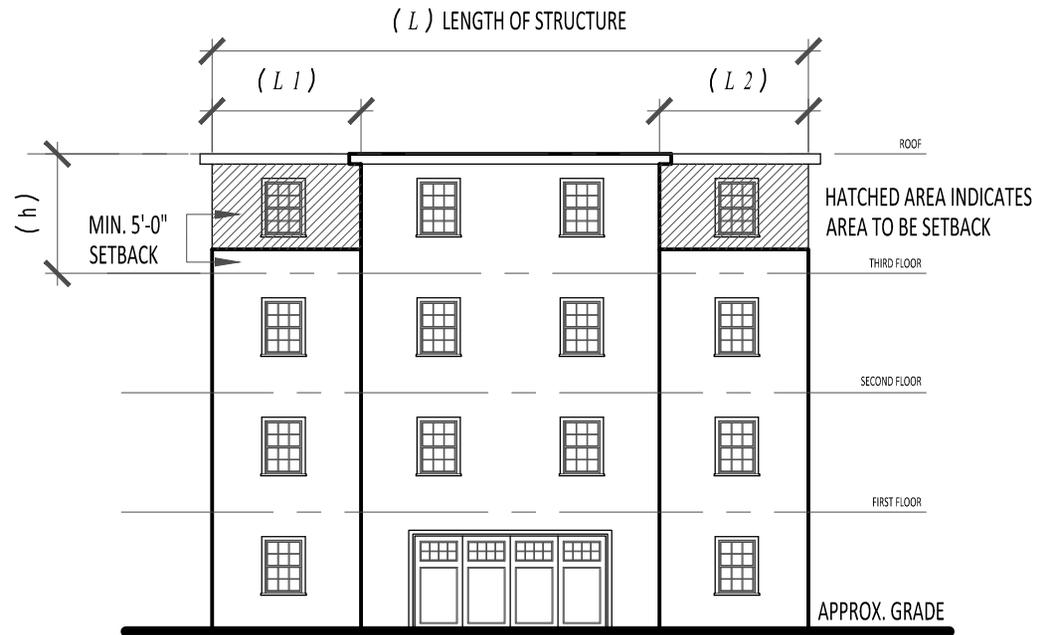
BUILDINGS IN THE QUARRY REDEVELOPMENT PLAN ZONE - STREET FACING FACADES
